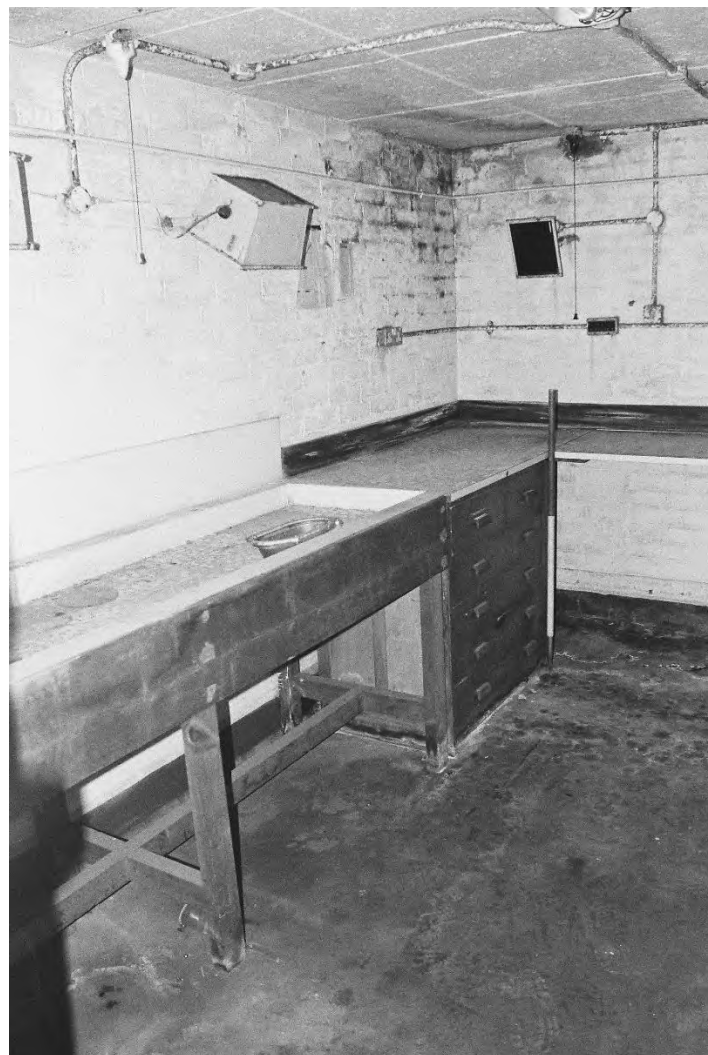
Block F: Interior Second Floor Room F5 (Swinden6_23). Facing South-west.
